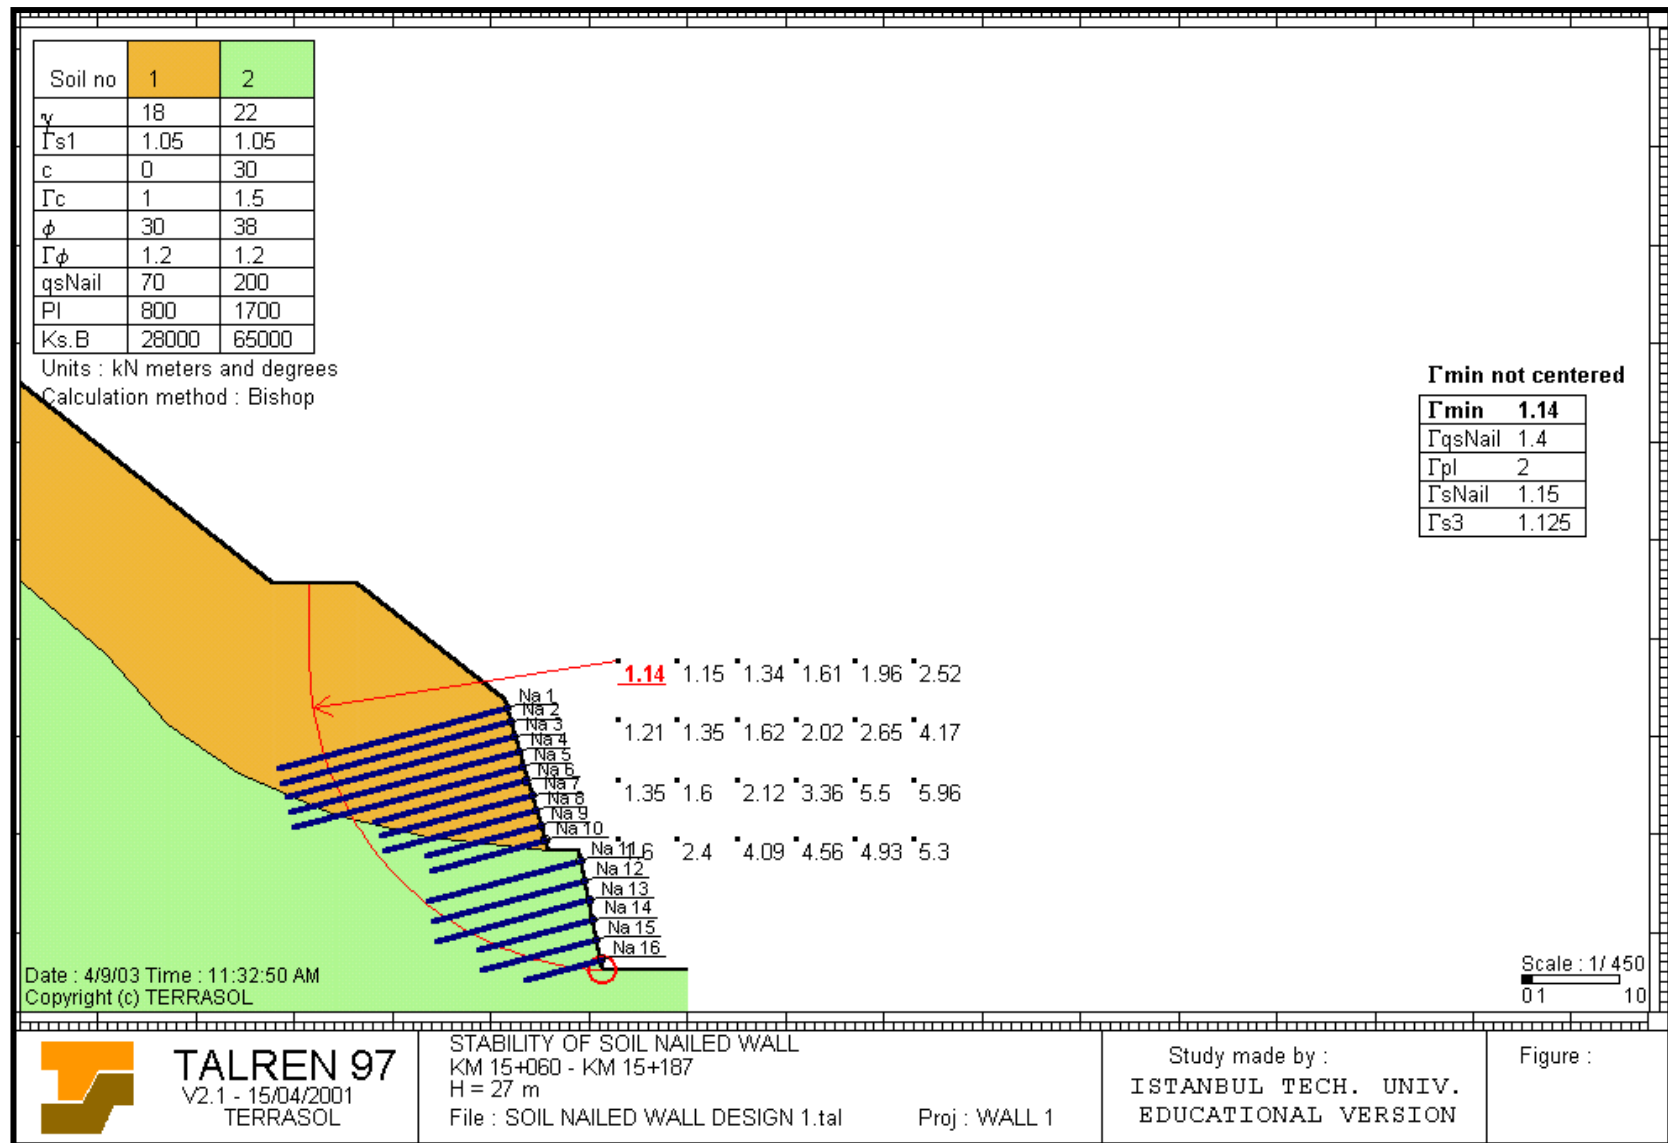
First static design and stability analysis of the soil nailed wall with TALREN 97
